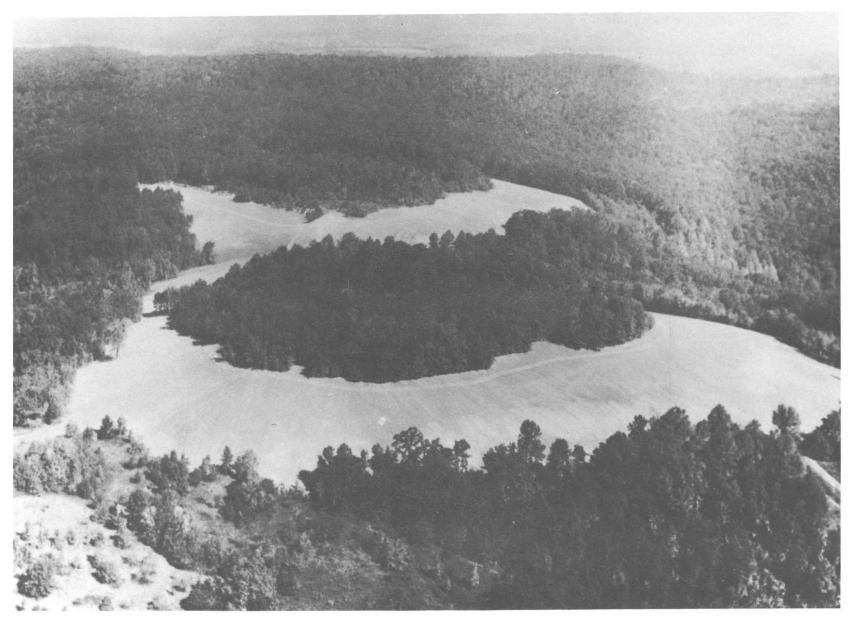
Aerial View of the North Central Section Following Backfilling and Grading.
